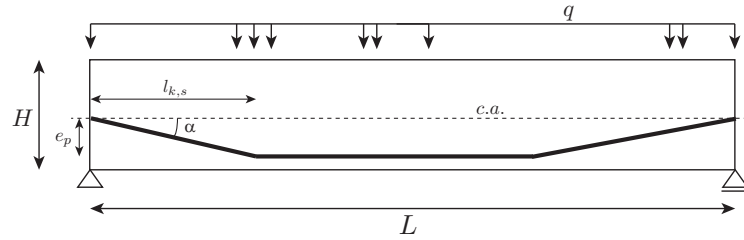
Longitudinal cross-section with a kinked tendon profile lay-out
